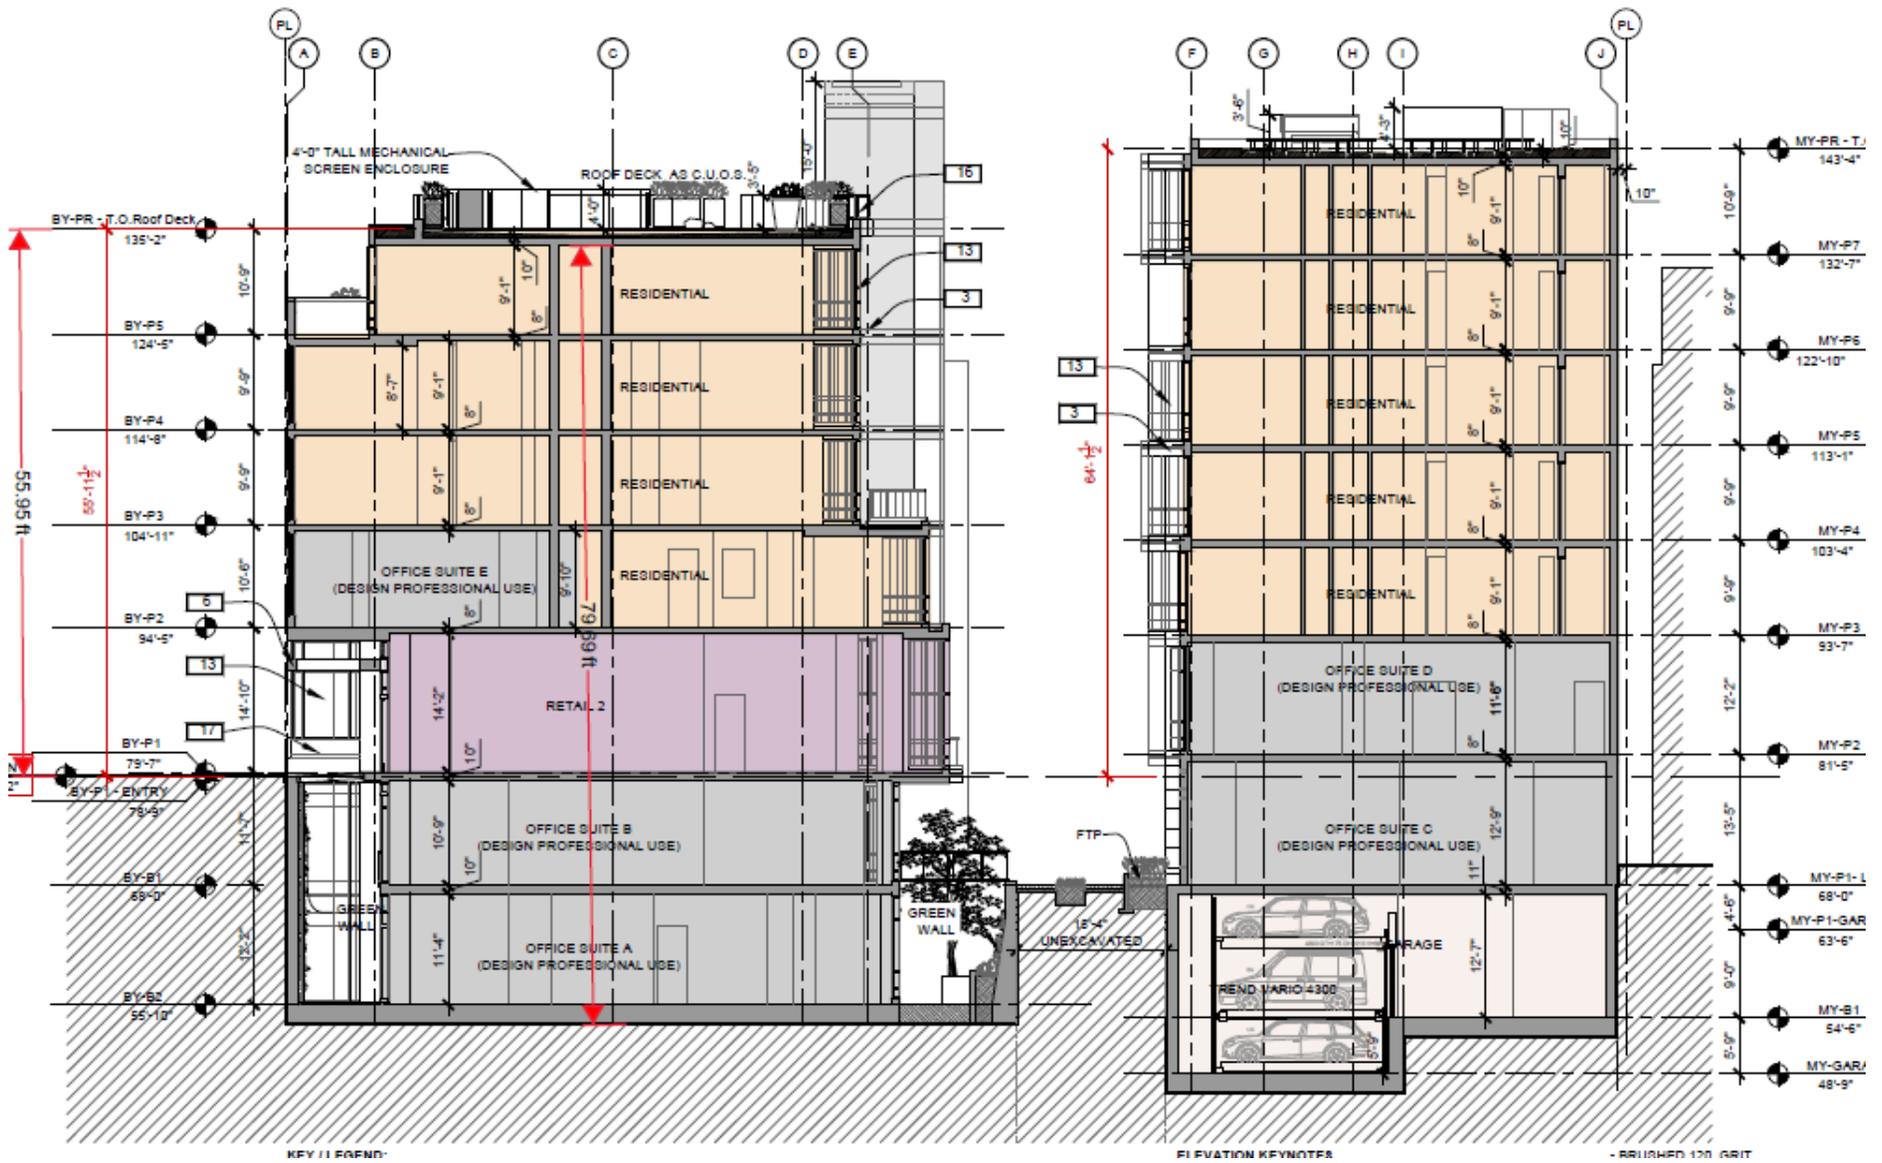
Section showing extent of proposed office space (gray shading), excerpted from project sponsor's plans
